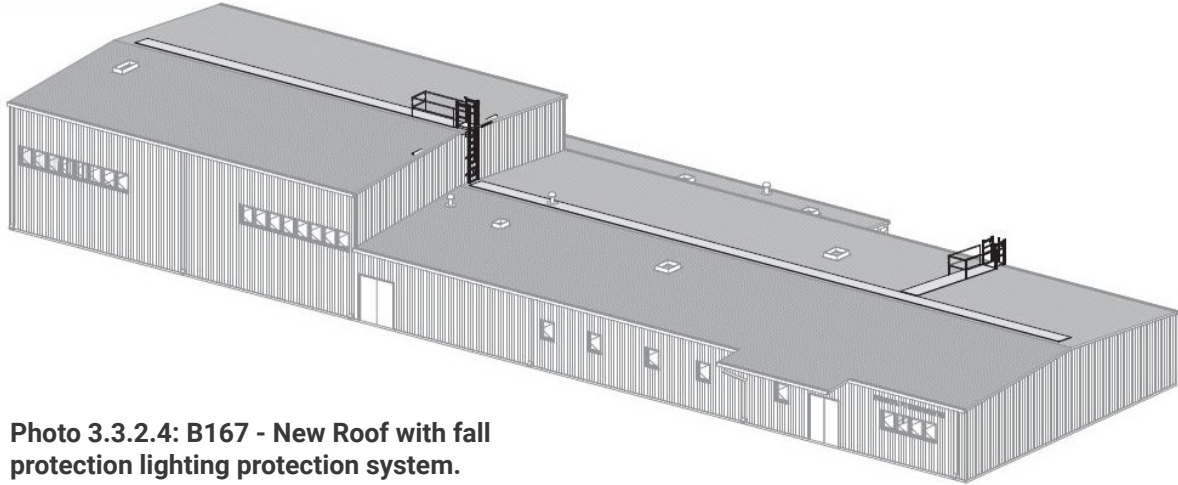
B167 - New Roof with fall protection lighting protection system.
